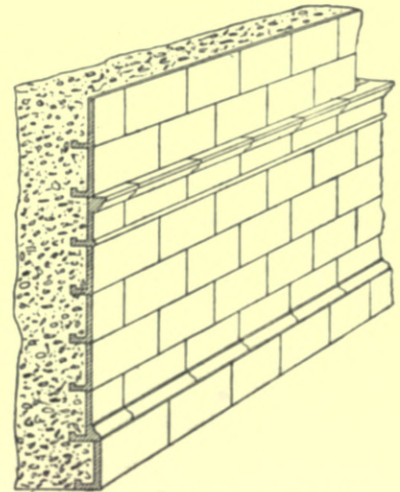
Concrete Wall Faced with Cockrill-Doulton Patent Tiles.
